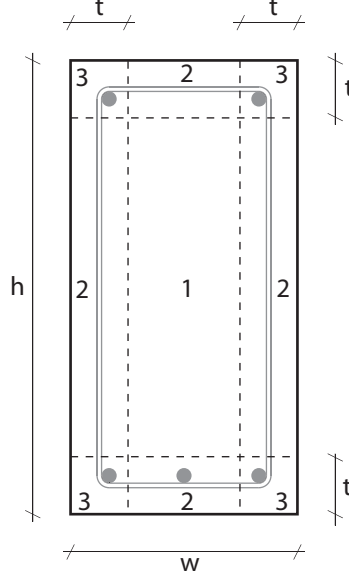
Rectangular beam example with longitudinal rebars and stirrups.
